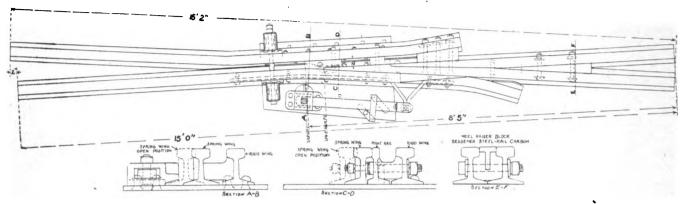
SHOWING PLANS AND SECTIONS OF SPRING RAIL FROG
